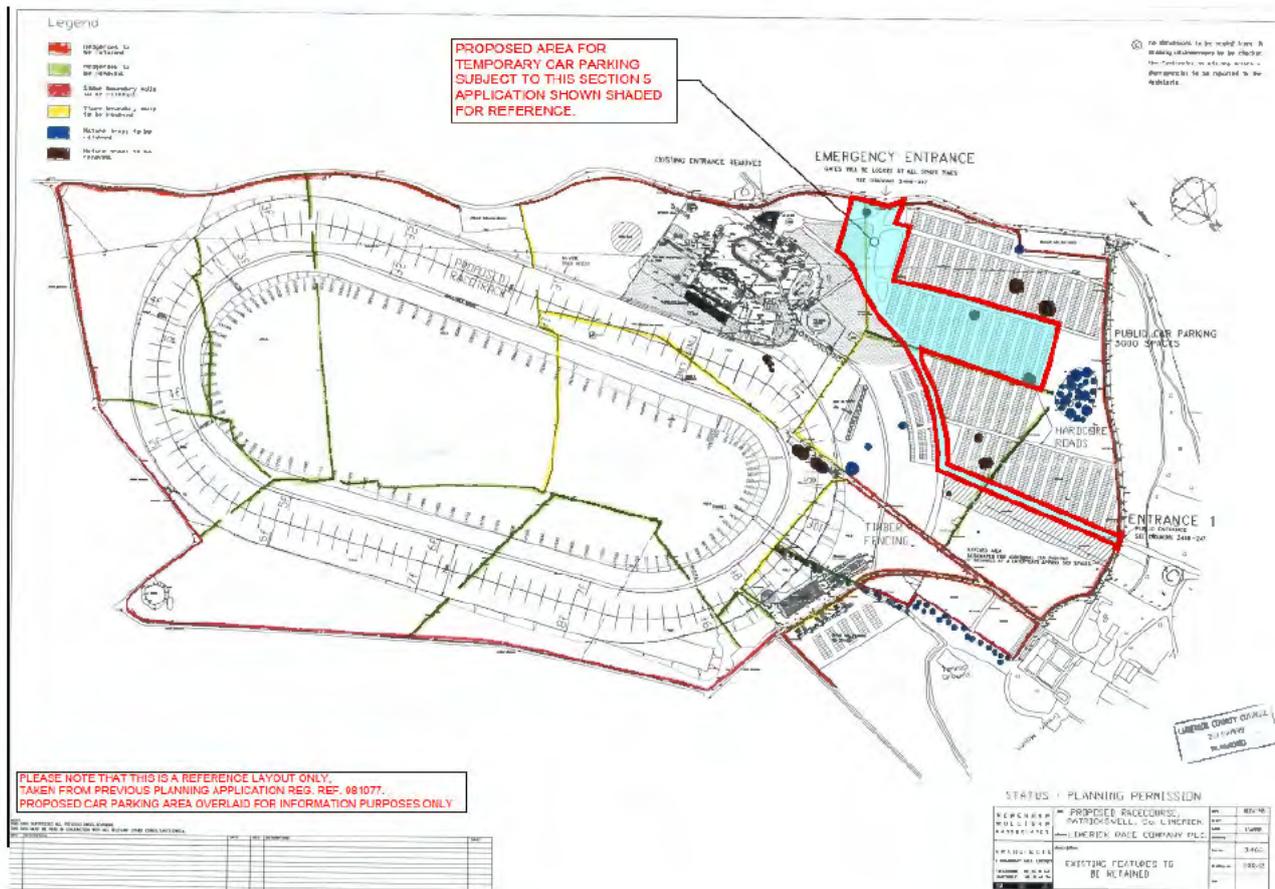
Site Layout (Source: Jacobs Engineering, Dec 2025)
